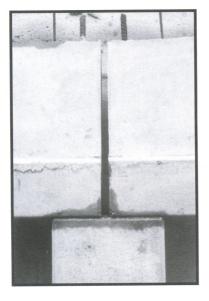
Column/Beam Connection With Vertical Dowel Bars
